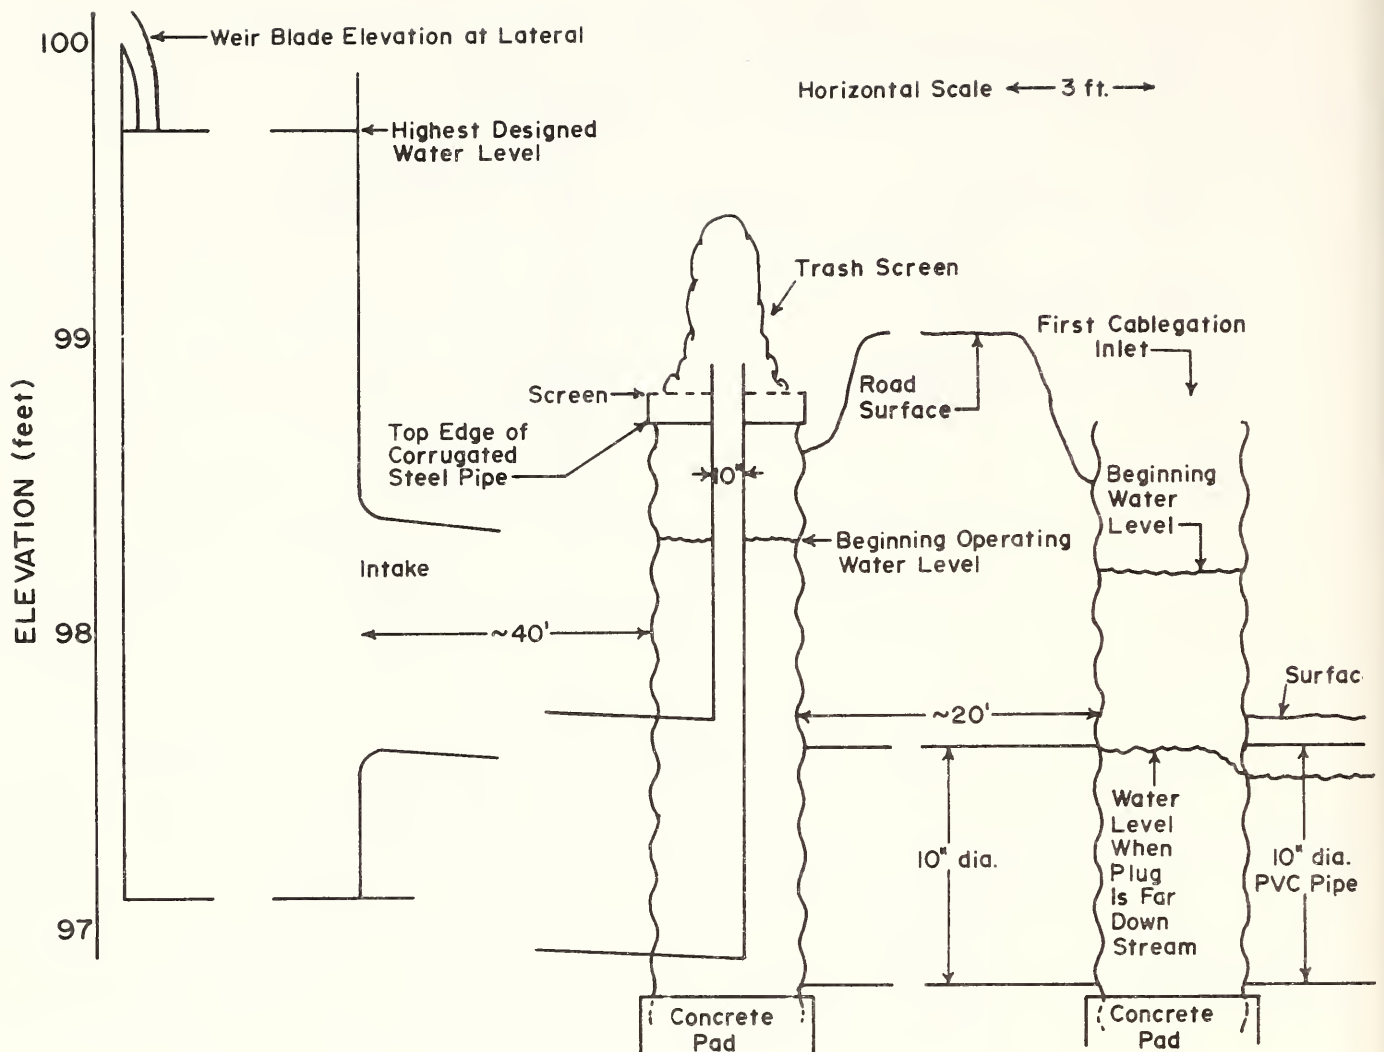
Structure elevations at top of field #1 Don Craig installation.
